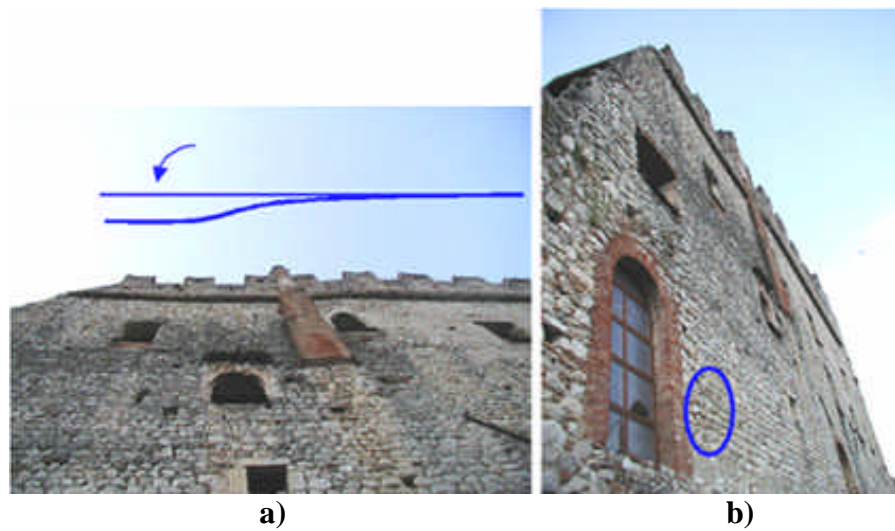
Avio Castle. Deformation of the South facade toward the valley
